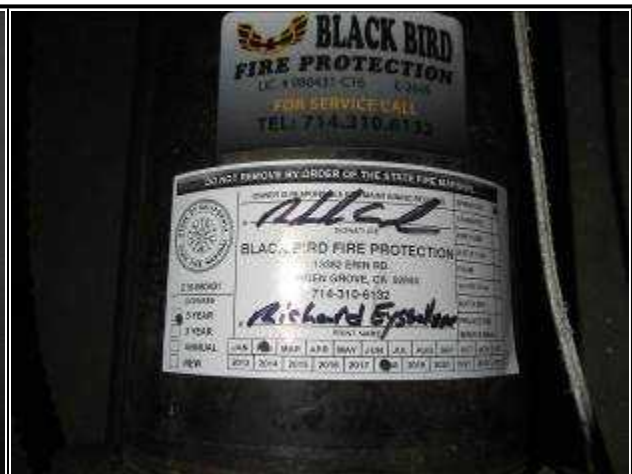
Fire sprinkler system inspection tag
